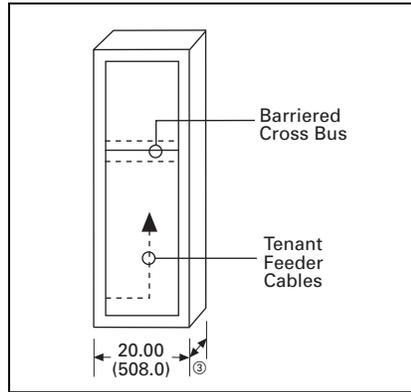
Load Side Pull Section with Barriered Cross Bus
